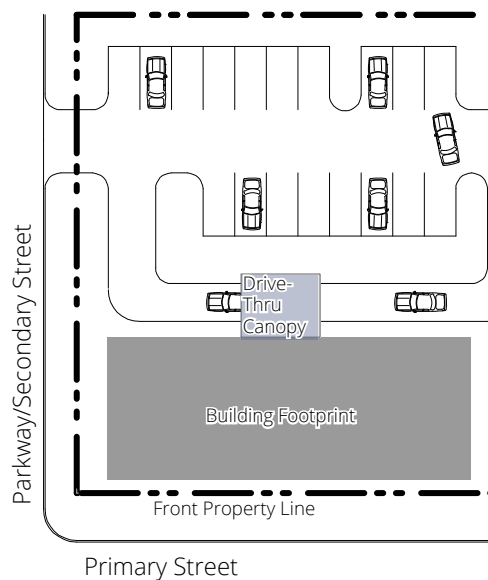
Recommended Drive-Through Facility Layout.
